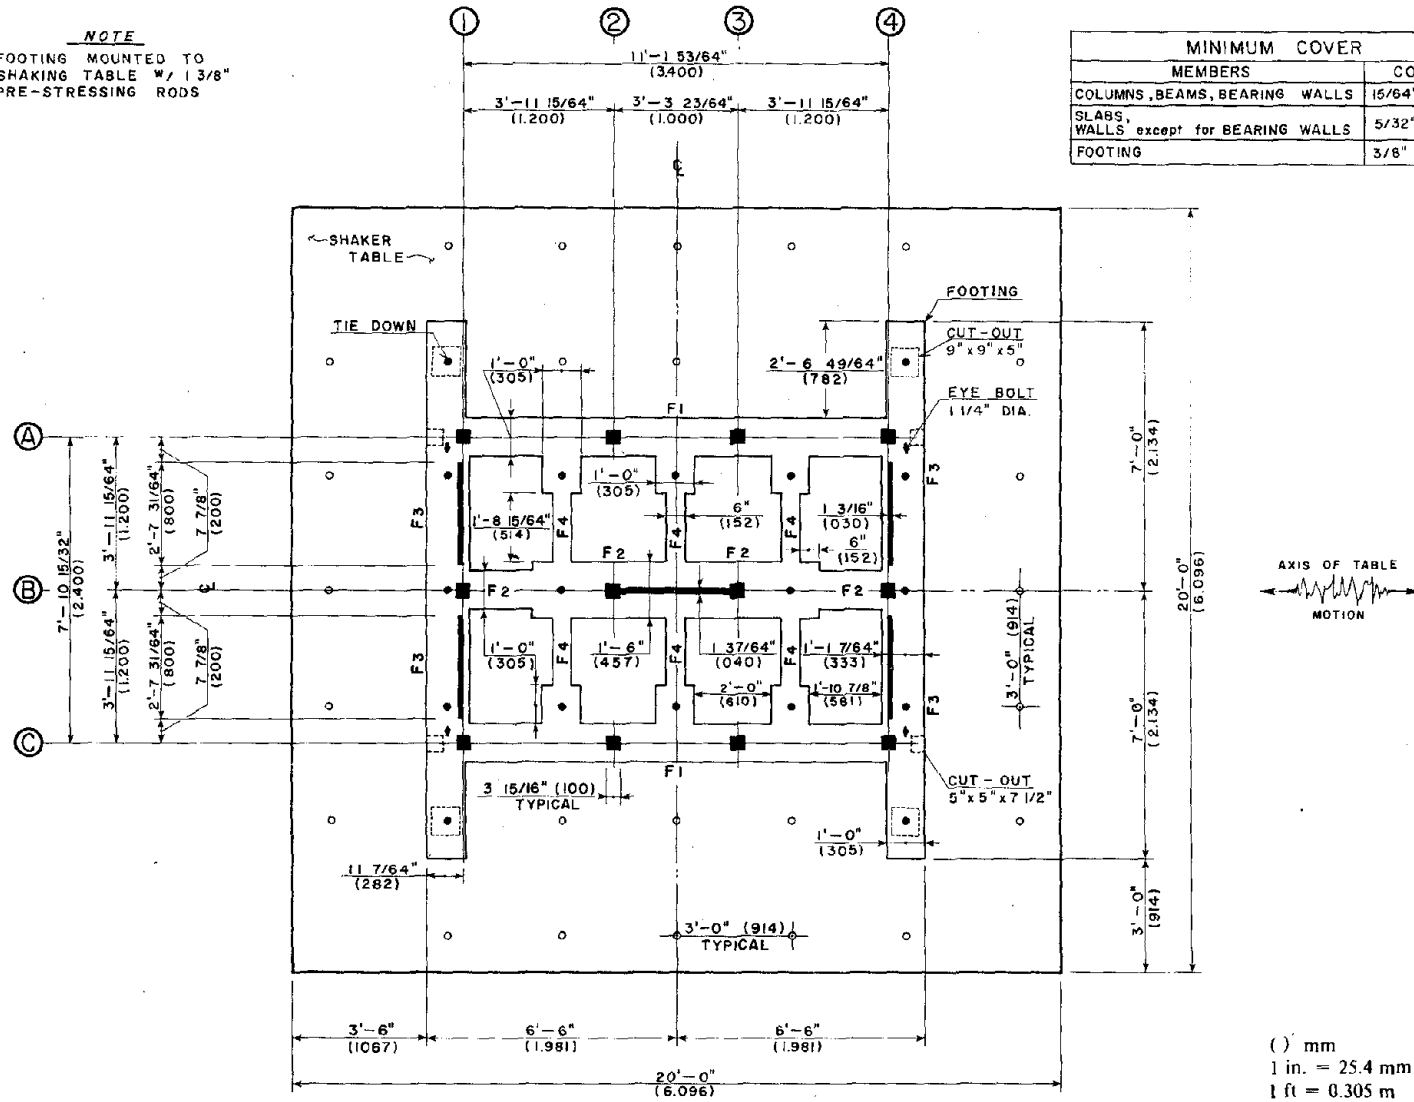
THE FOUNDATION OF THE 1/5-SCALE MODEL.
